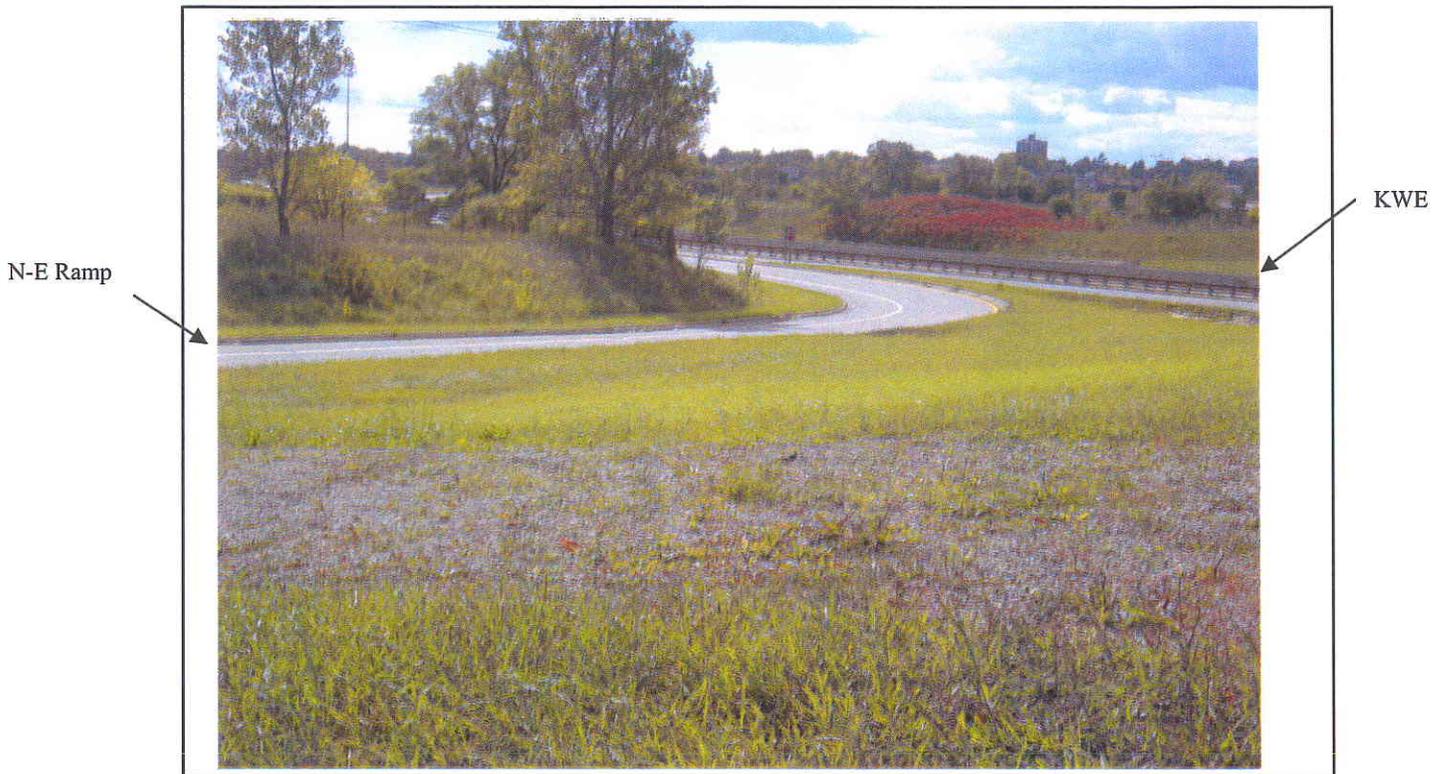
Looking at the east side of KWE and south side of Wellington Street. Borehole 08-022
